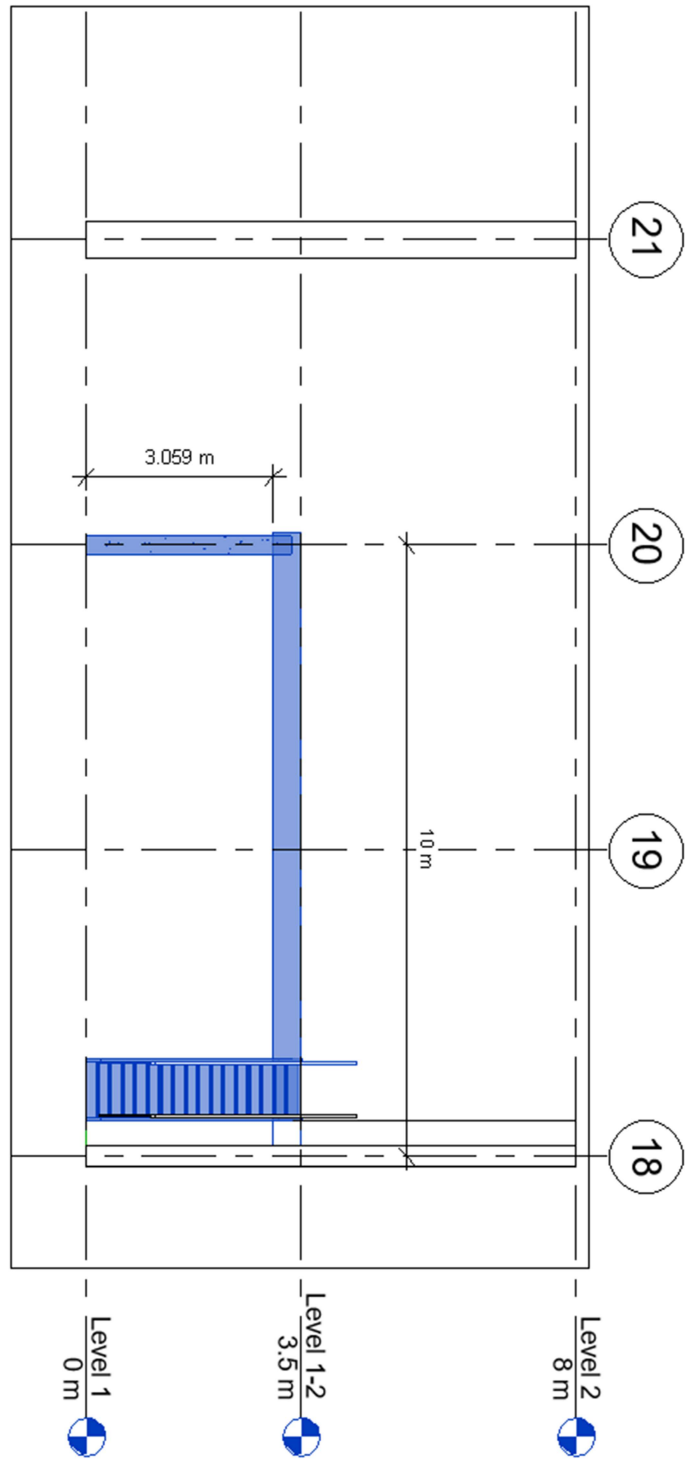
2D plan of the laboratory of Civil Engineering located in building C of the ULB Solbosch campus.
